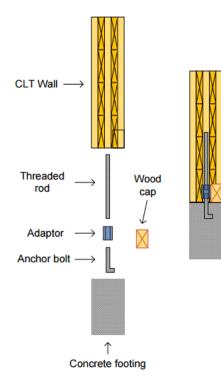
Wall to foundation connection using threaded rod and anchor bolt. (Adapted from Mohammad 2011)
